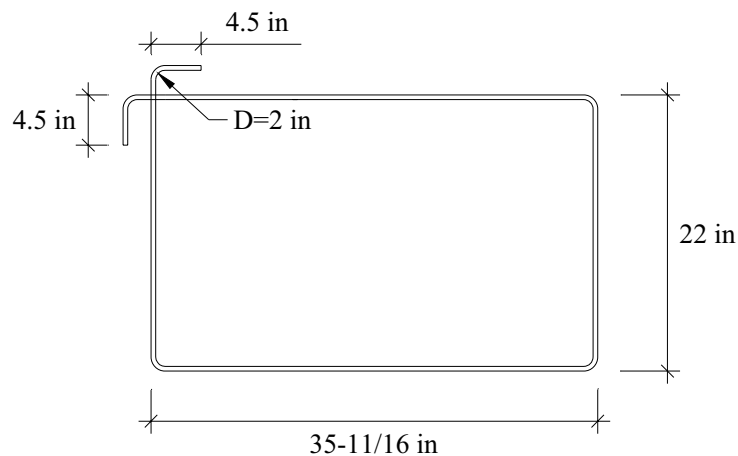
Section B-B; Detail Overlapping Tie (A) #4; Specimens H1 & H2
